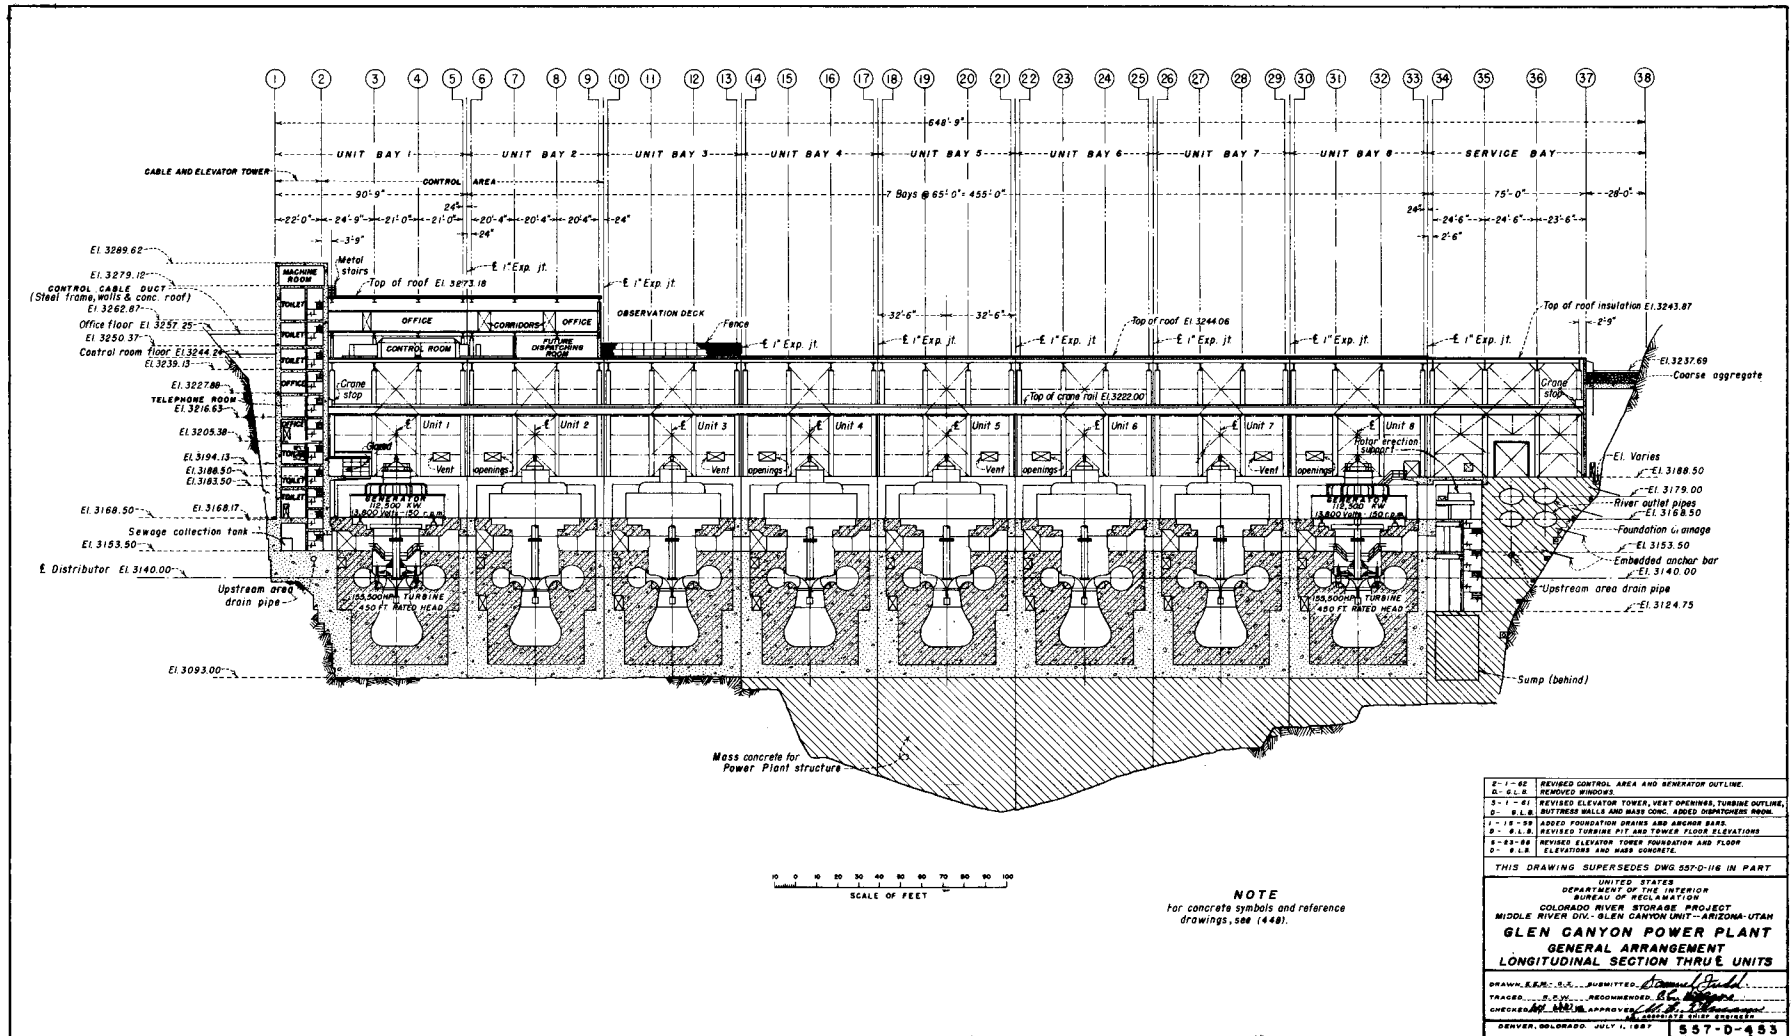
Powerplant general arrangement—Longitudinal section through centerline of units.
